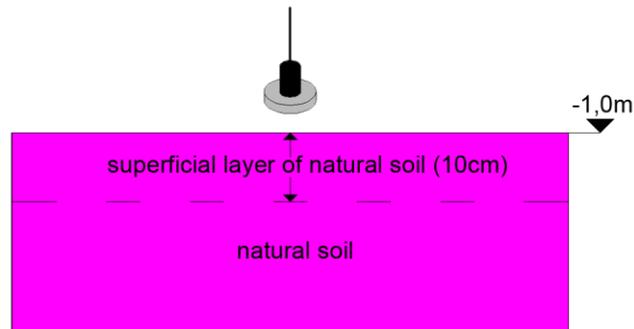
Structure of the pavement foundation - areas 1 and 2
